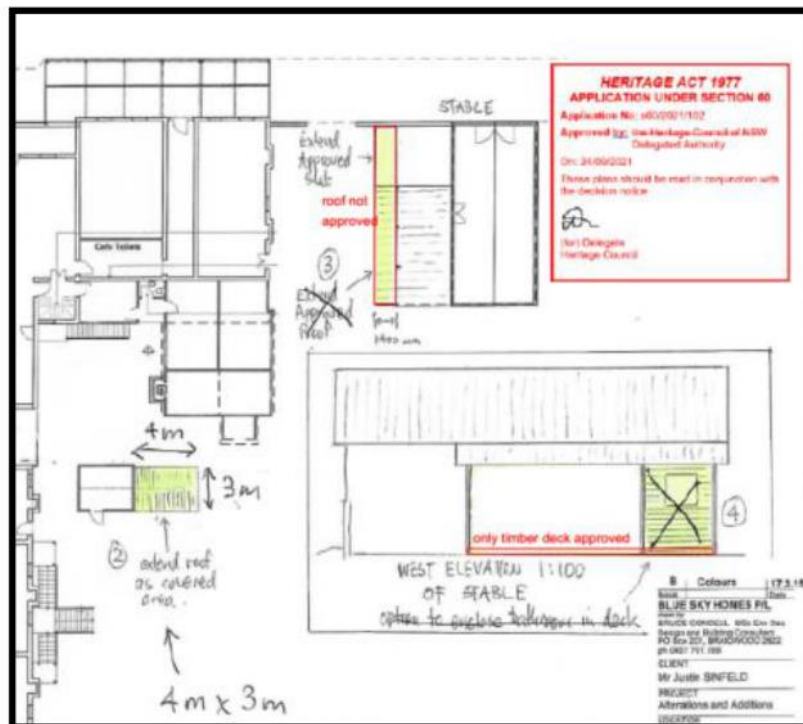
Proposed works – roof to brick store, timber deck and slab to stables
